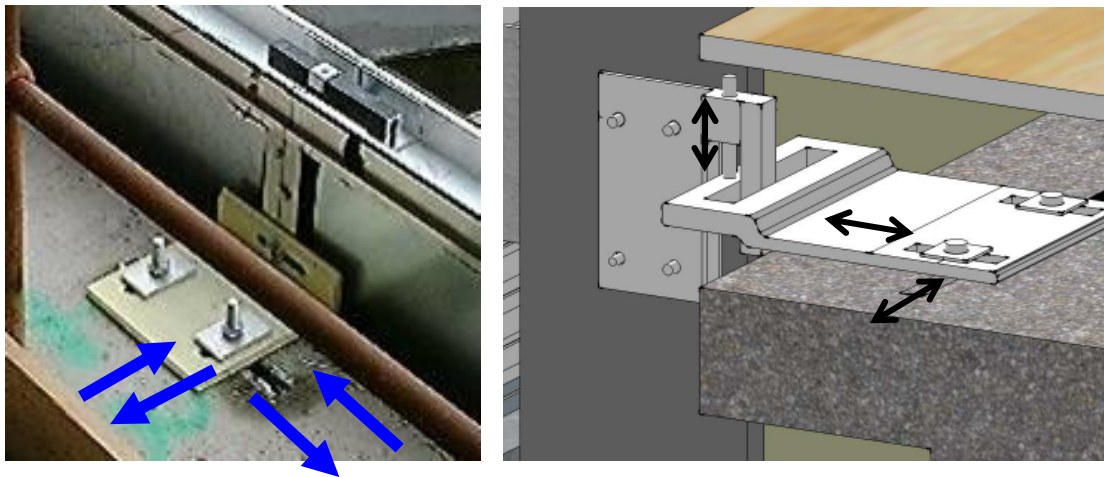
Floor brackets for top of slab connection (shims needed for vertical adjustment) and edge of slab connection with three direction adjustment (Buro Happold Intranet)
